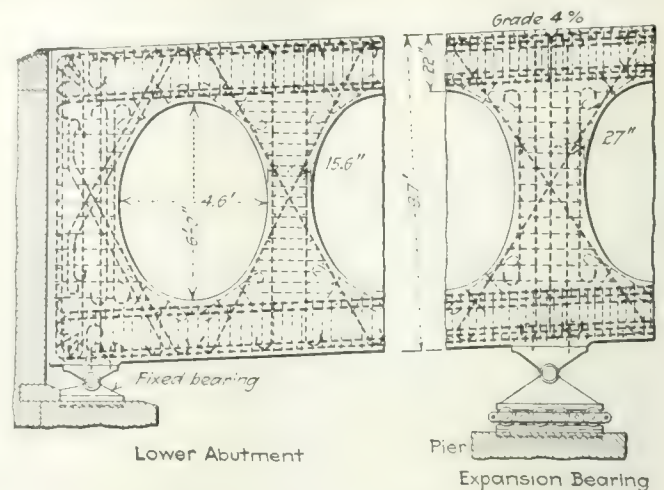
CONCRETE TRUSS HAS CHORDS AND POSTS ONLY
